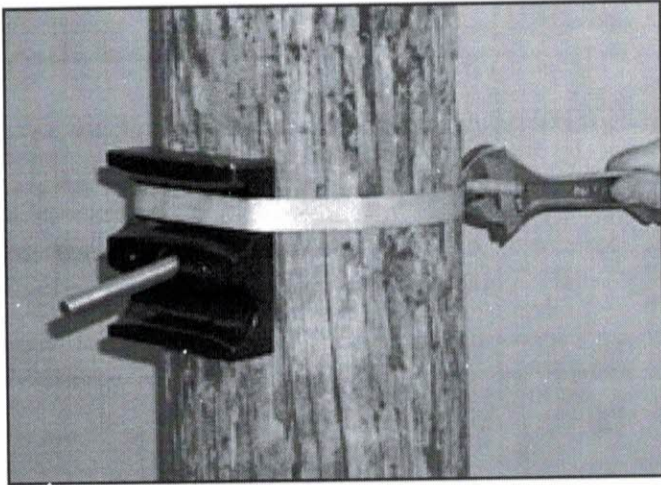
INSTALL CARRIAGE BOLT
